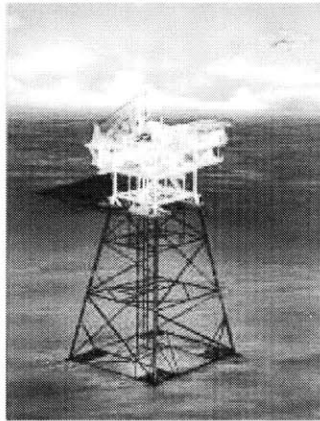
Offshore structure application (fire protection panels, water piping systems, walkways & flooring, tanks and vessels, cables housings, shelters, etc).
